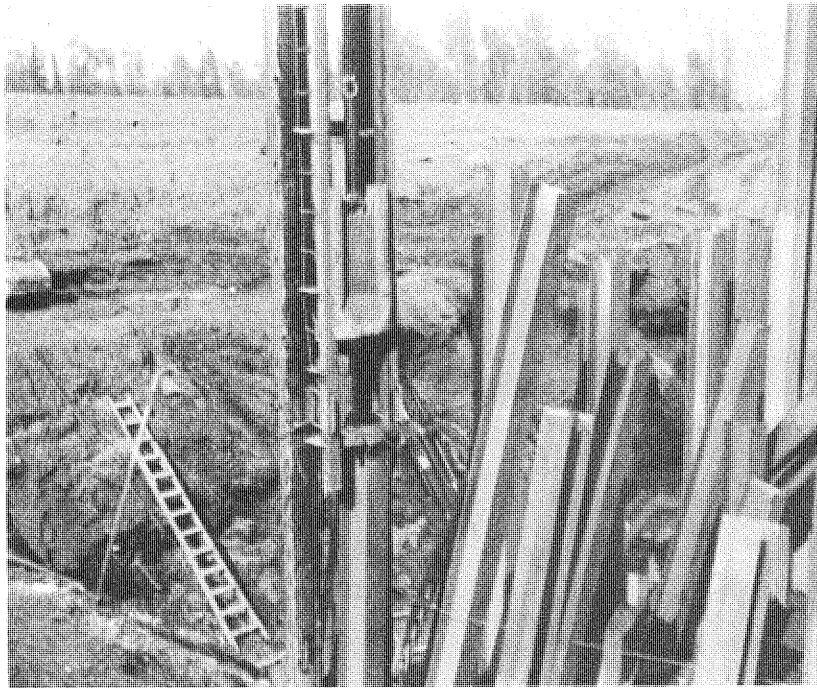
A 3,000-pound drop hammer operating on steel H-pile at the powerplant site. Vertical and battered piles show at right prior to being cut off to grade. P783-908-1412, July 15, 1953.
